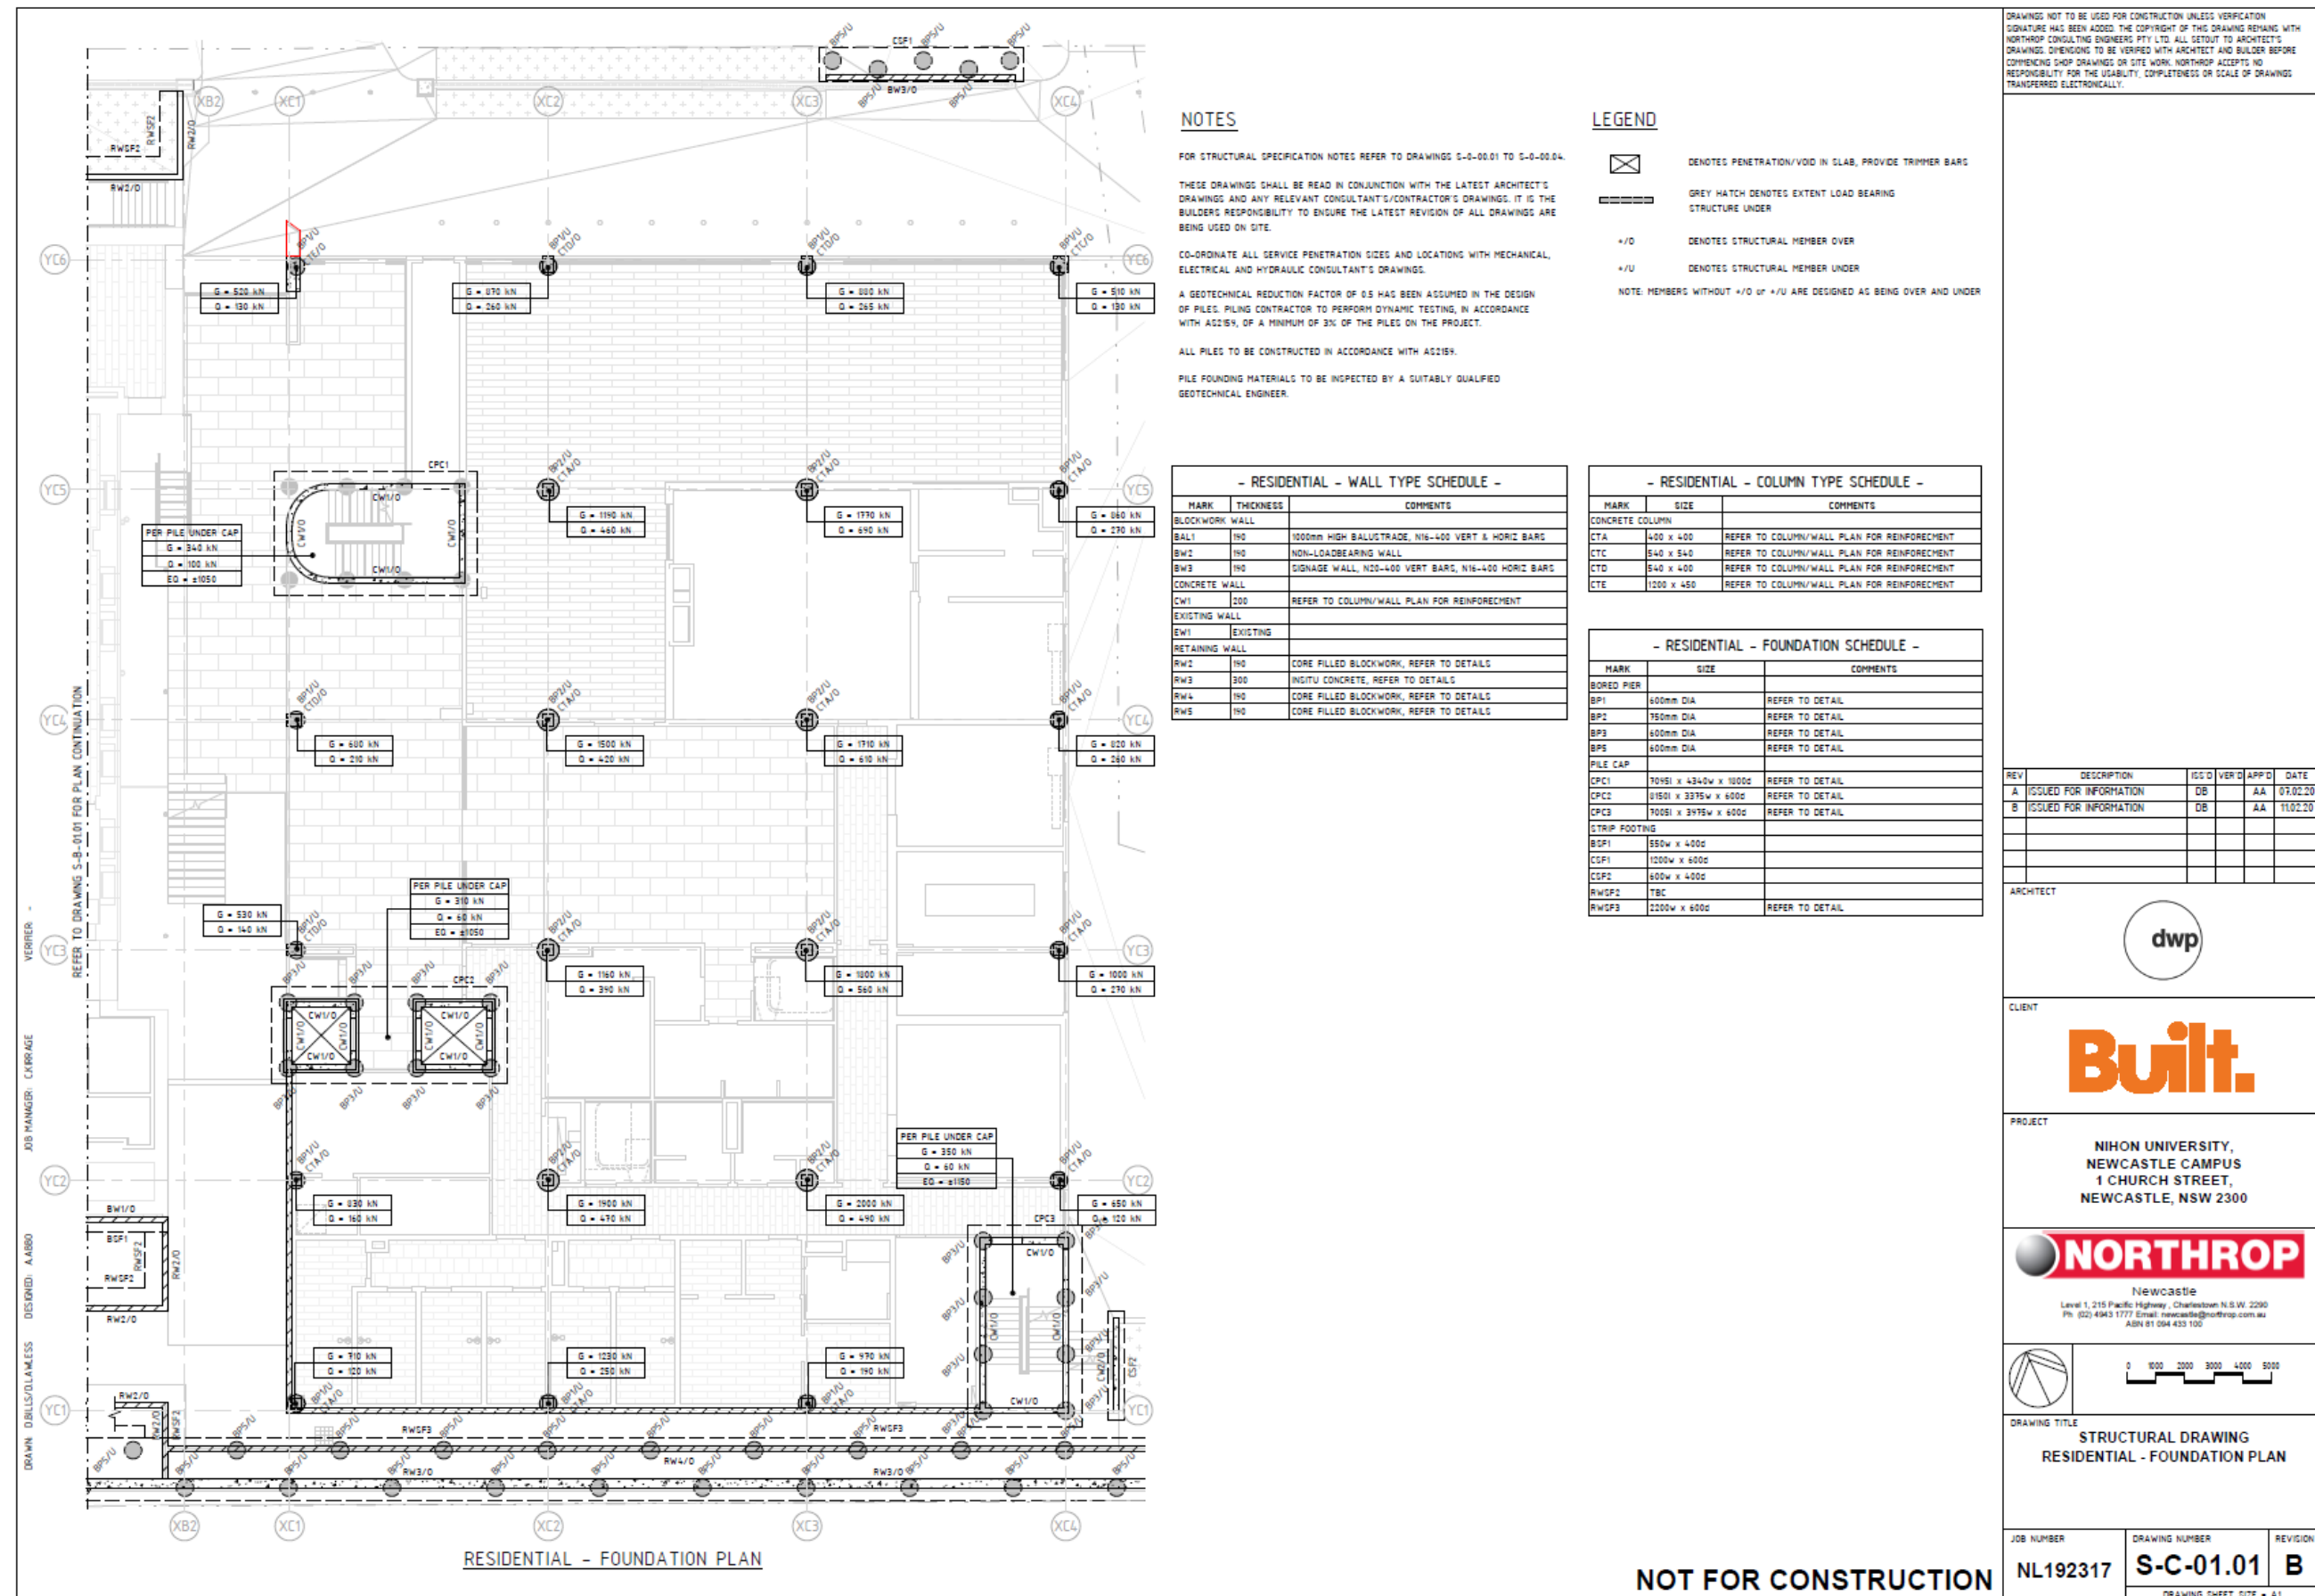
Residential Building – east side of site, showing piling foundation plan.
